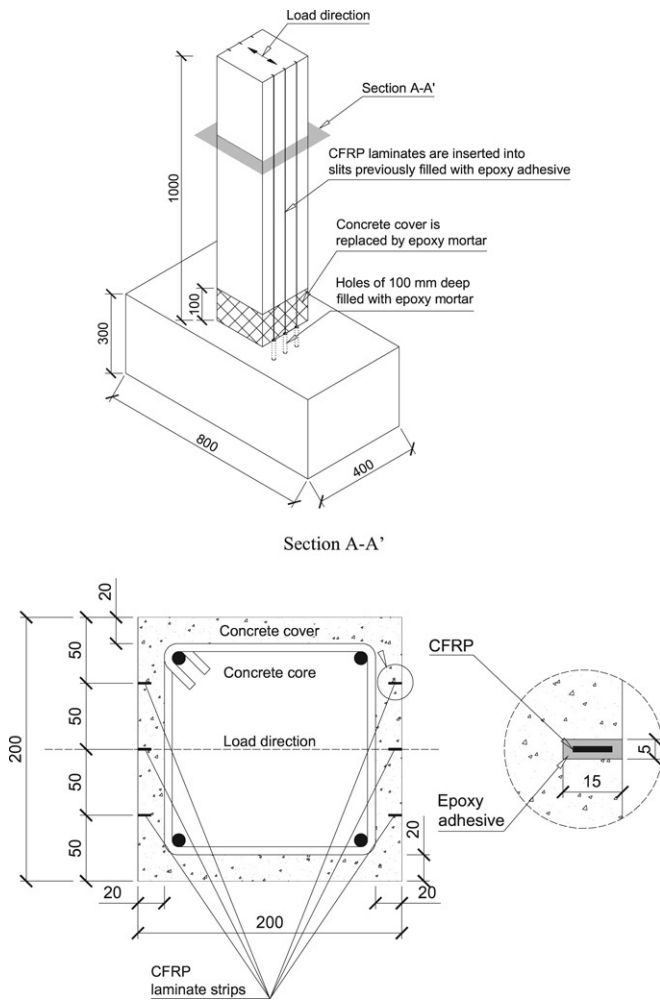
Adopted flexural strengthening technique for RC columns (dimensions in mm).
